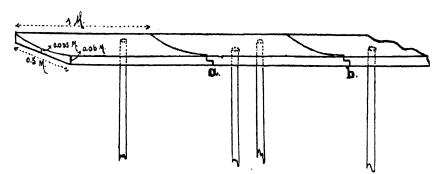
Sanitation of Baoe-Baoe Swamp. Construction of the floor of main drain. Cement slabs connected by rectangular joints as at a and b and supported by mangrove piles driven about 3 metres into ground.
